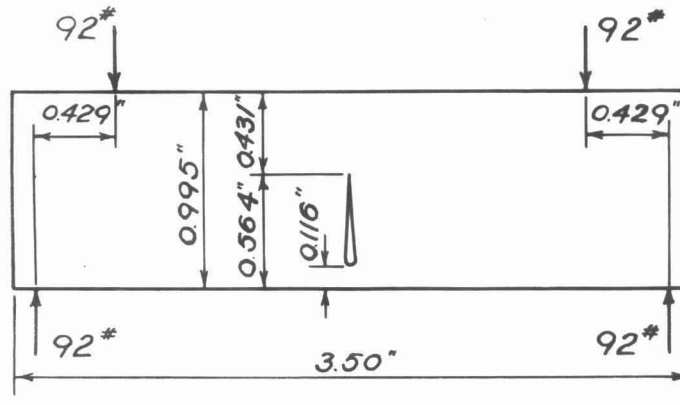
Bakelite Model of a Cracked Beam with Tensile Reinforcement
